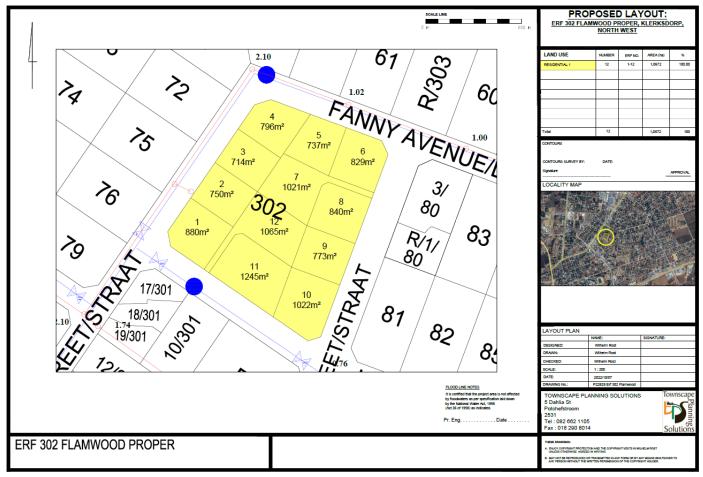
Proposed layout plan Erf 302 Flamwood Proper
